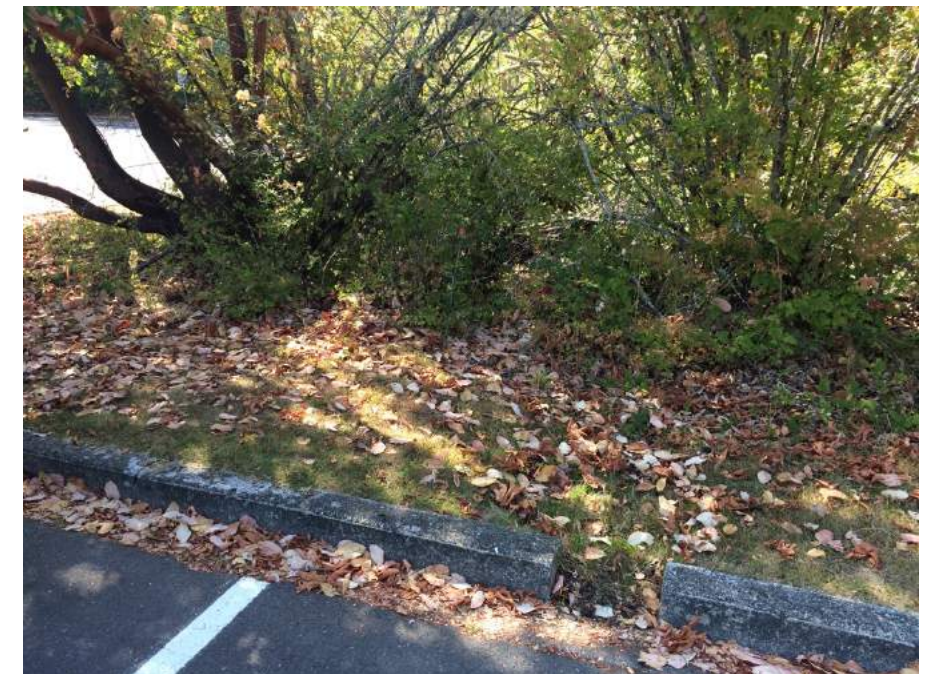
B-12. Curb cuts in Parking Lot 8: some lawn/runoff areas need to be slightly deepened to create a ponding area for runoff.
